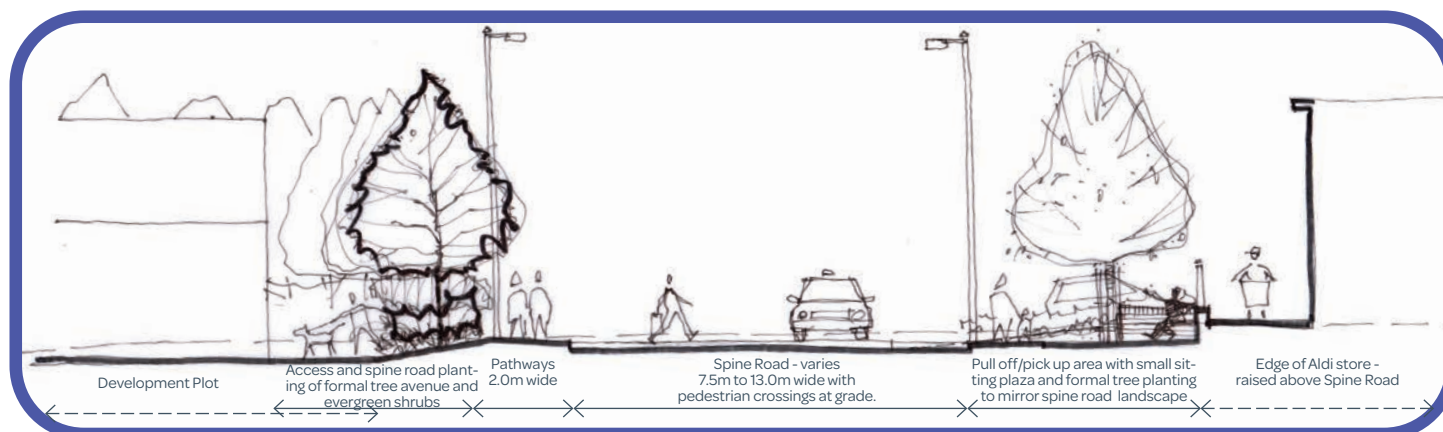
SECTION GG' - General section through the northern arrival avenue/axis
